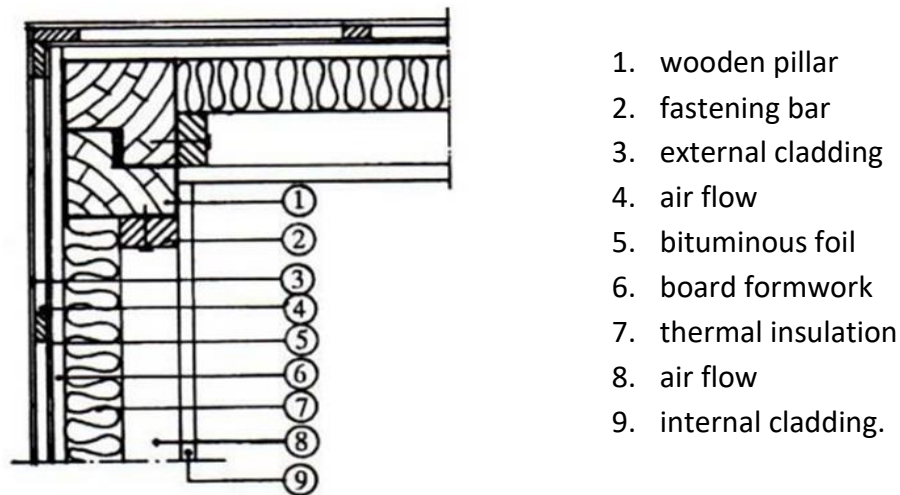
Example of prefabricated wooden wall. (Husetic & Beganovic 2017)
